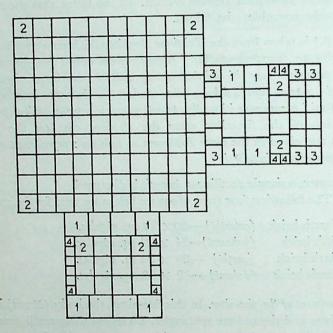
Arrangement of bricks in the first layer of a caturaśra śyenacit (northern wing not shown).
